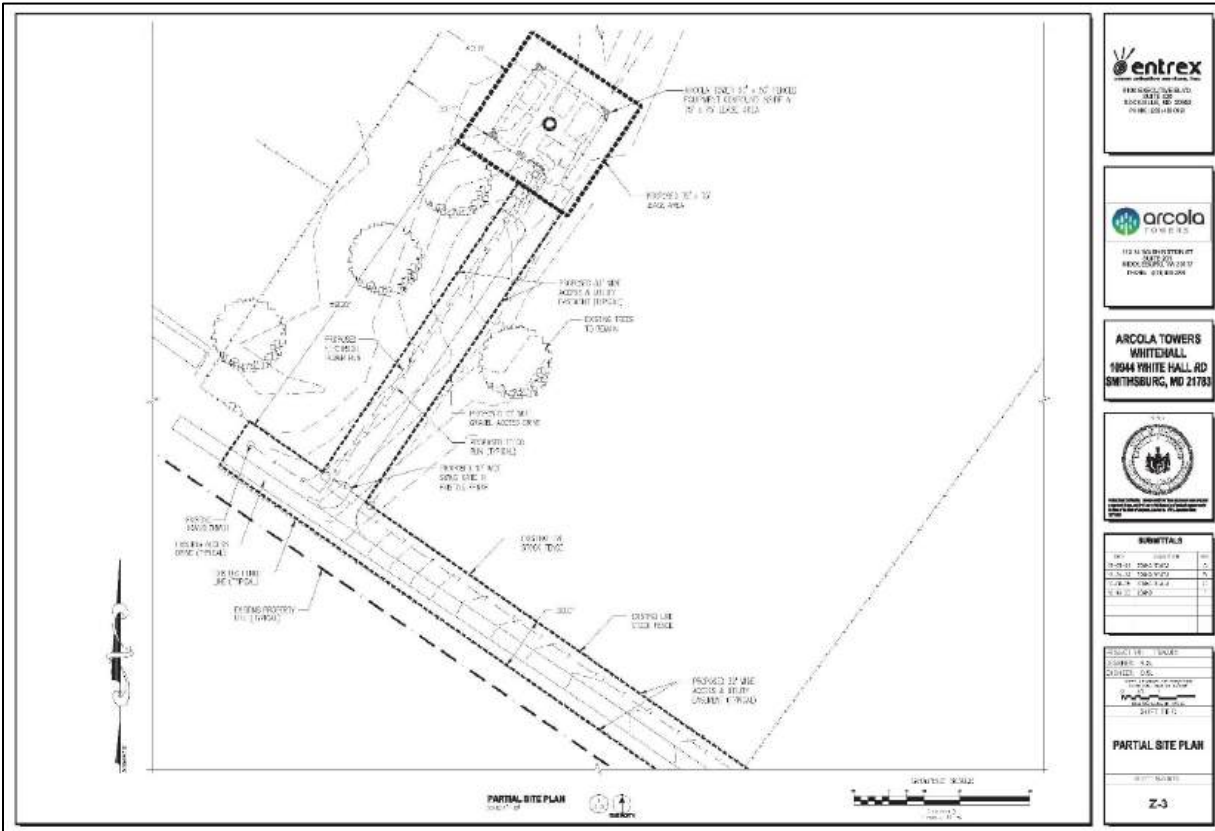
Detailed View of Proposed Cell Tower Location and Installation (Arcola Towers 2025).
